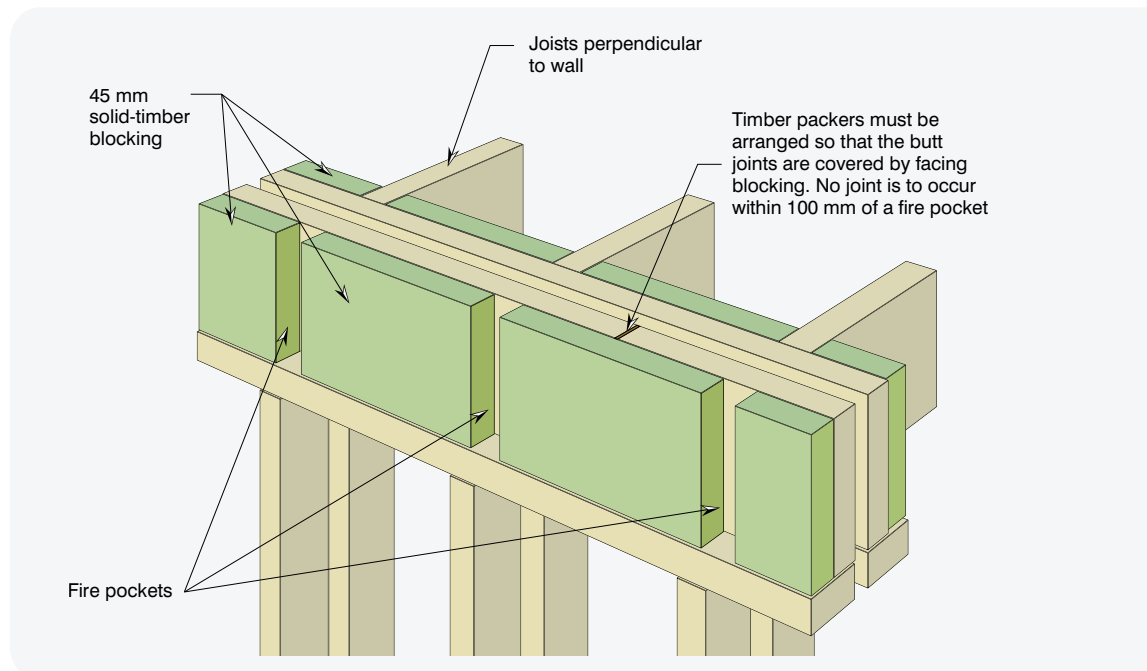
Pockets created in separating wall to accommodate floor joists – FRL 60 minutes only – perspective view.
